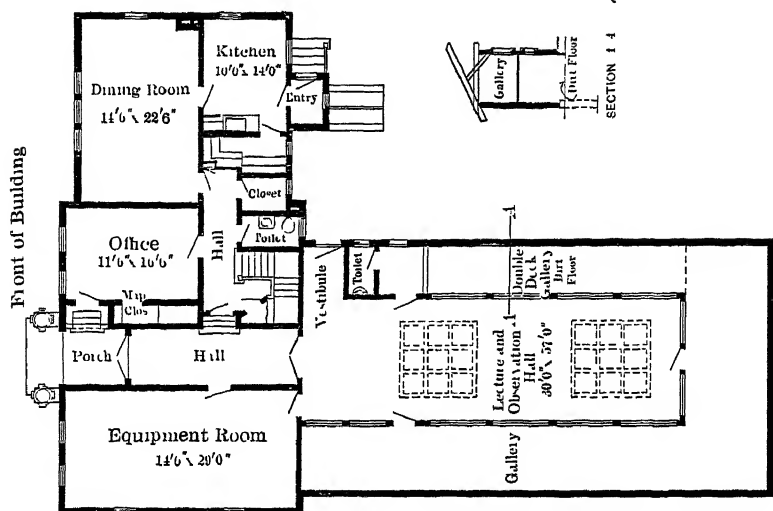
FIRST-FLOOR PLAN, SPRINGFIELD MINE-RESCUE STATION.
